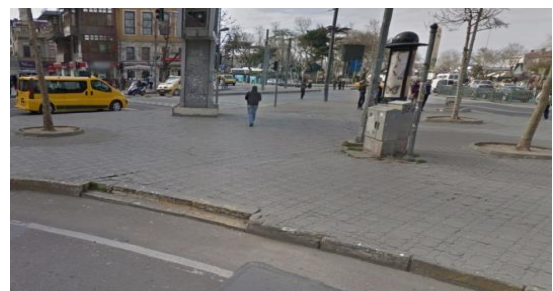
Failure ramp, stairs on ramp, ramp Kadıköy, İstanbul
